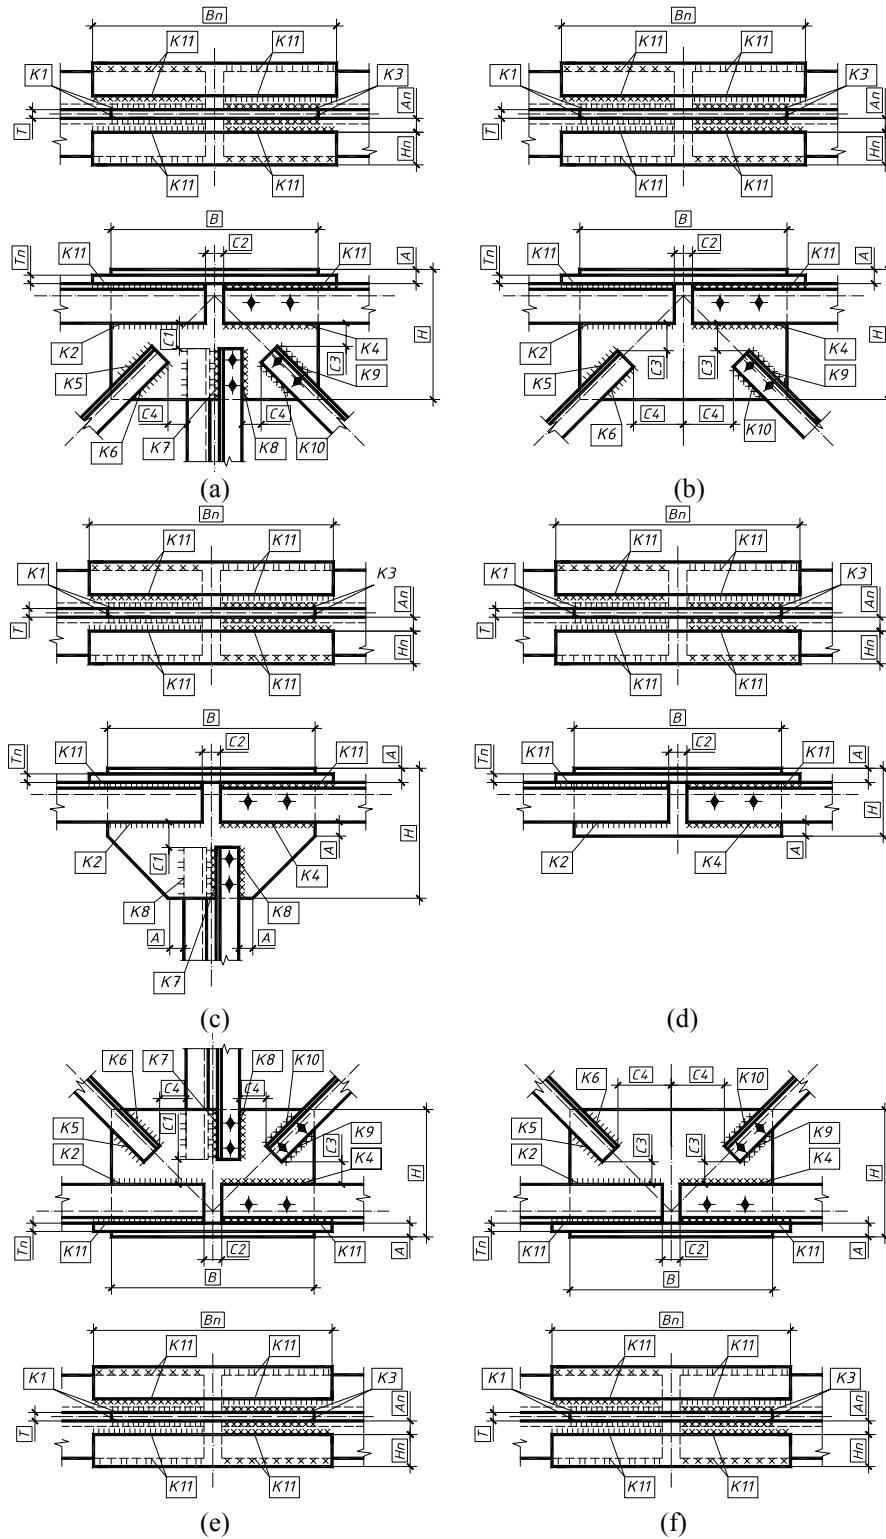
Erection joints in trusses with elements made of double angles.
